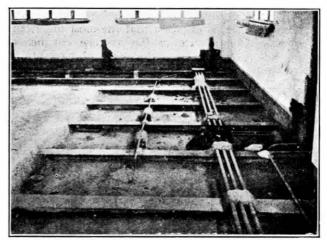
3-WAY STEEL CONDUIT IN COURSE OF INSTALLATION.
